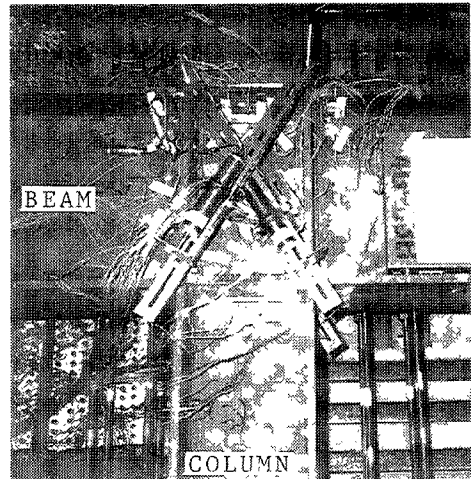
Panel zone deformation after test (SPEC. XBN-C)
